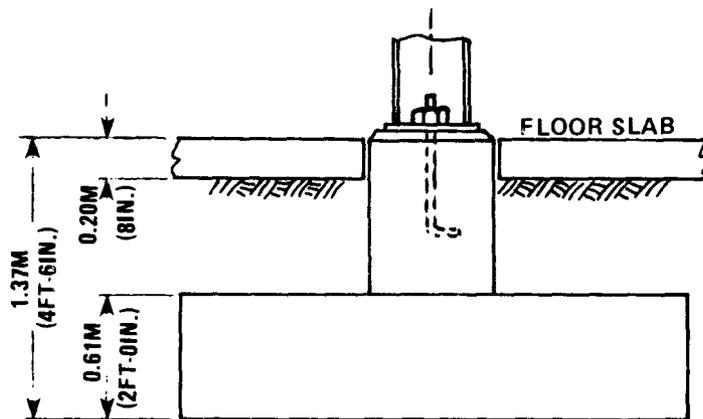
TYPICAL COLUMN FOUNDATION
